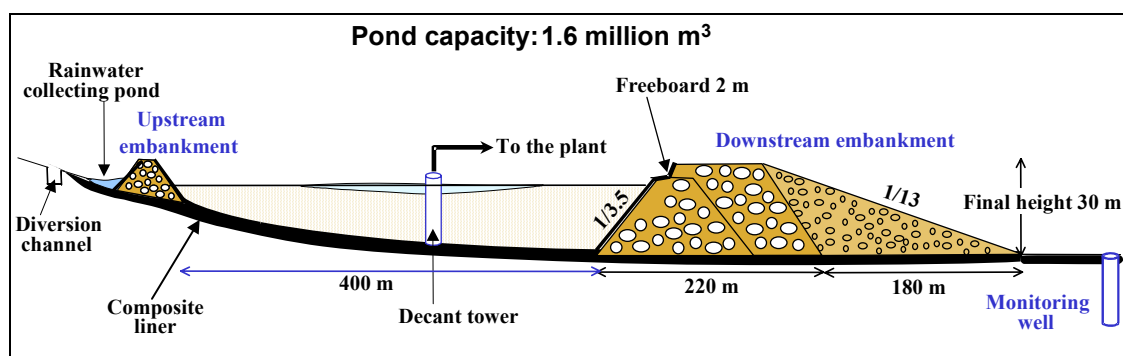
Cross-sectional drawing of Ovacik tailings pond [56, Au group, 2002]
